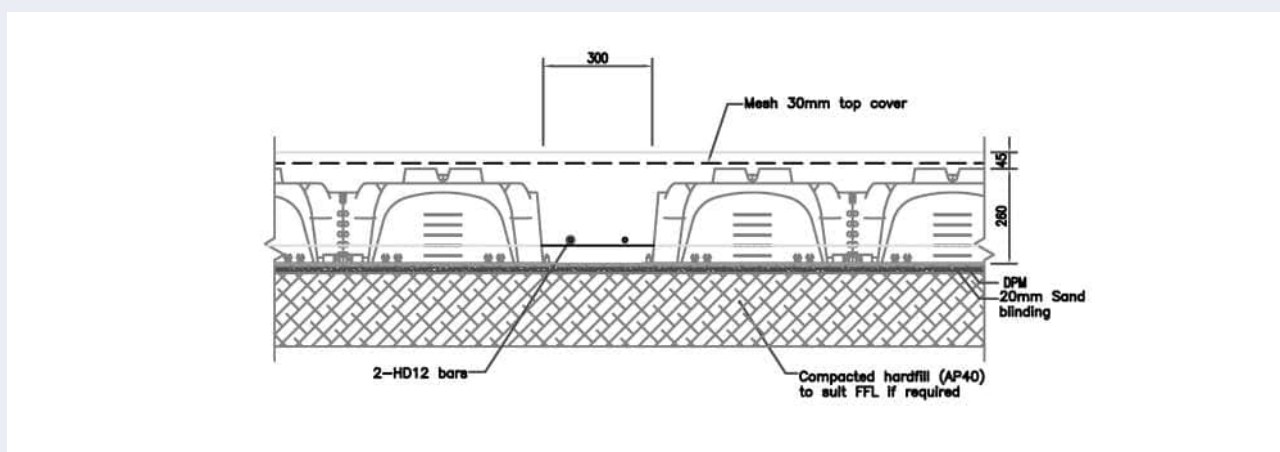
Qpod internal loadbearing wall or slab thickening
